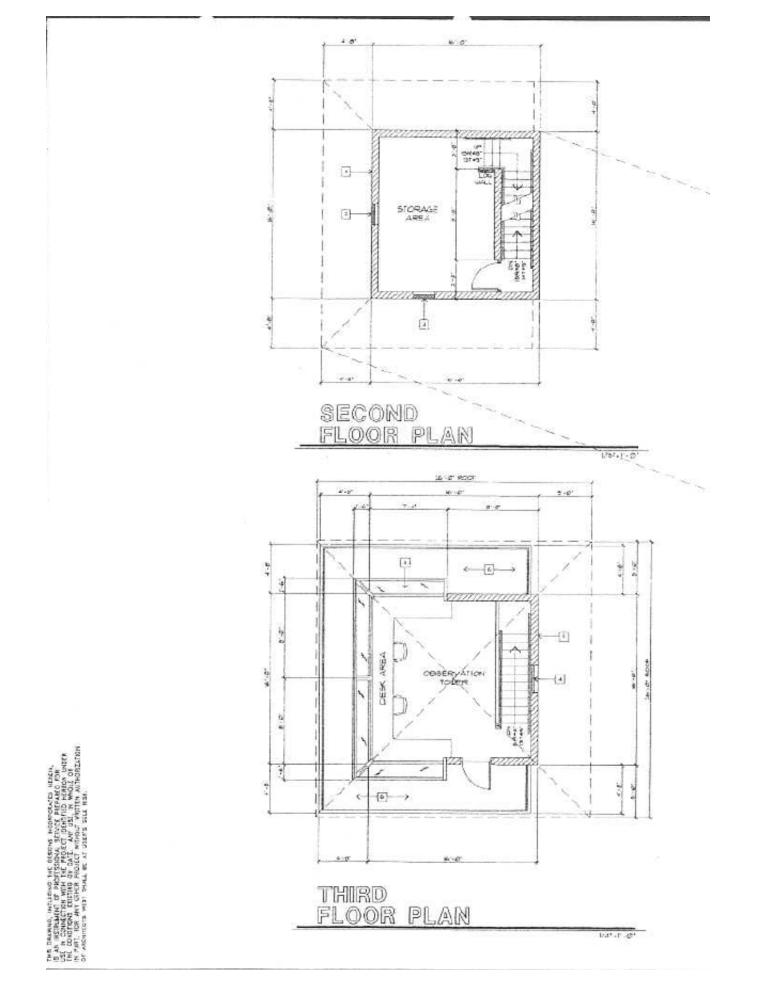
A-4-VNT-08-057 / A-4-VNT-08-100 Floor Plan
